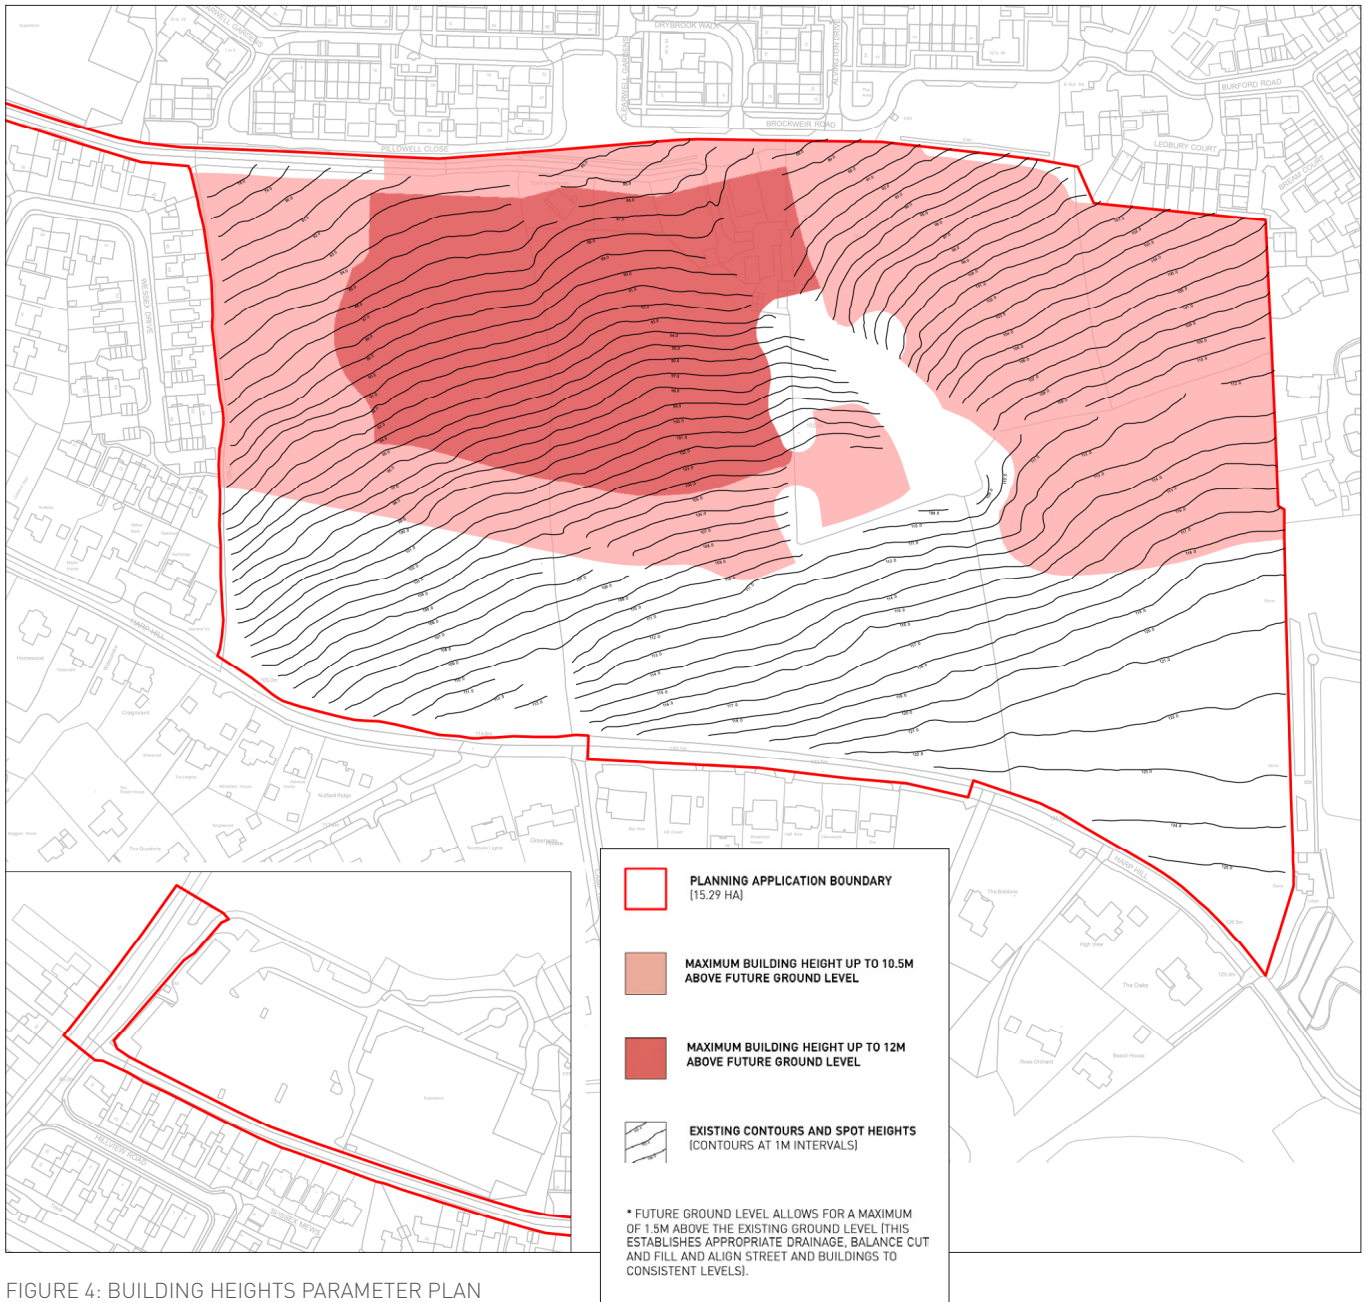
BUILDING HEIGHTS PARAMETER PLAN
